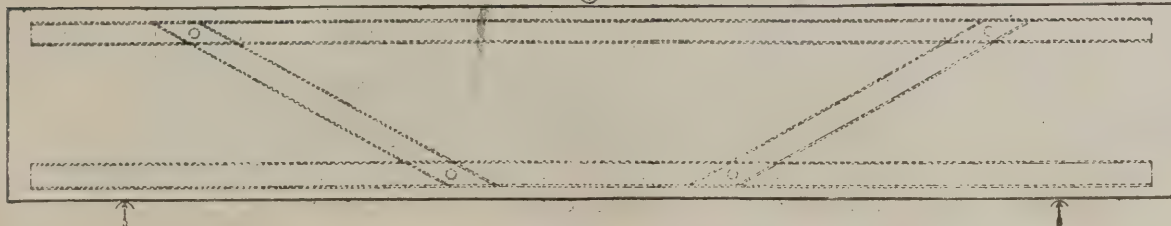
SECTION OF WILLIAMS BEAM REINFORCEMENT AS TESTED BY KIRKALDY AND SON.
